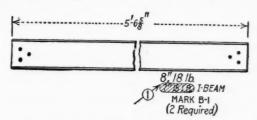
METHOD OF MAKING ALTERATIONS ON DRAWINGS
